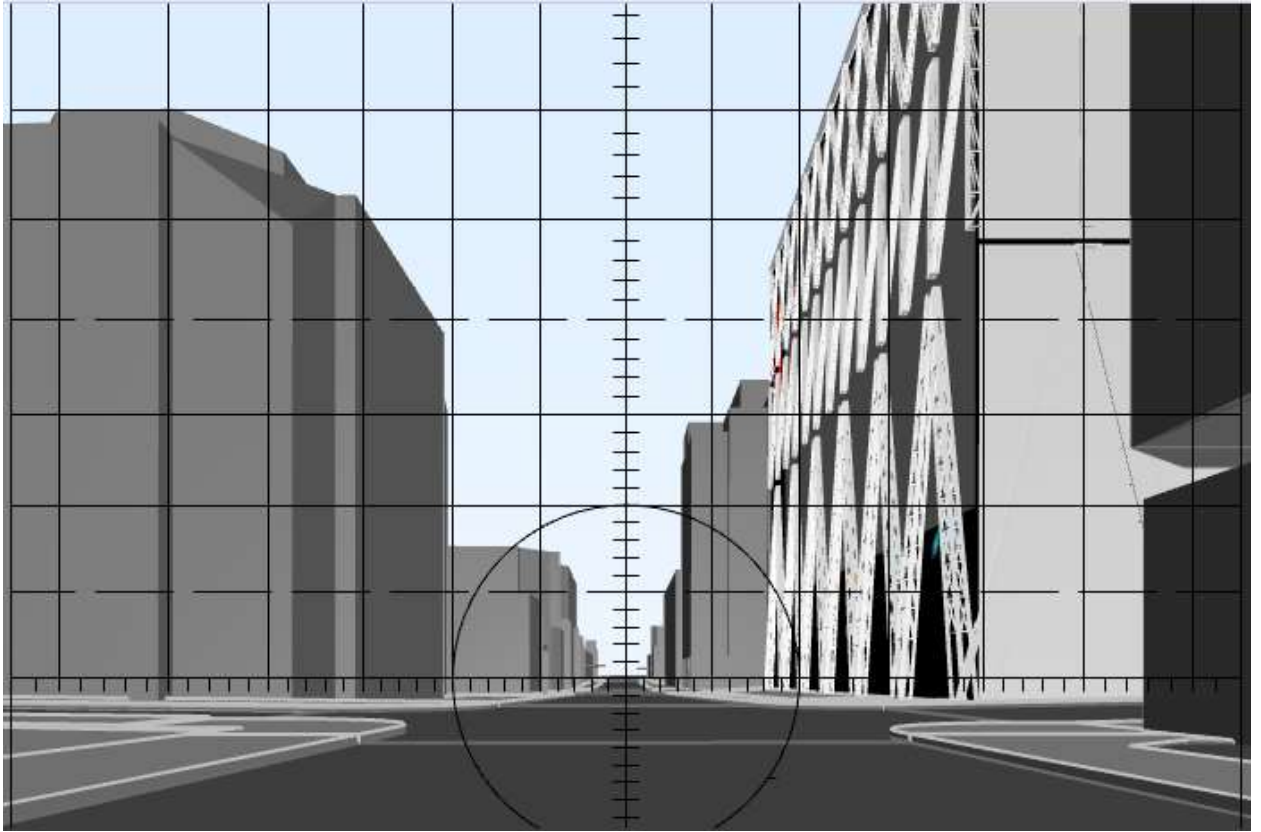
Perspective view from road with the inclusion of the truss structure - Phillip Street towards west
